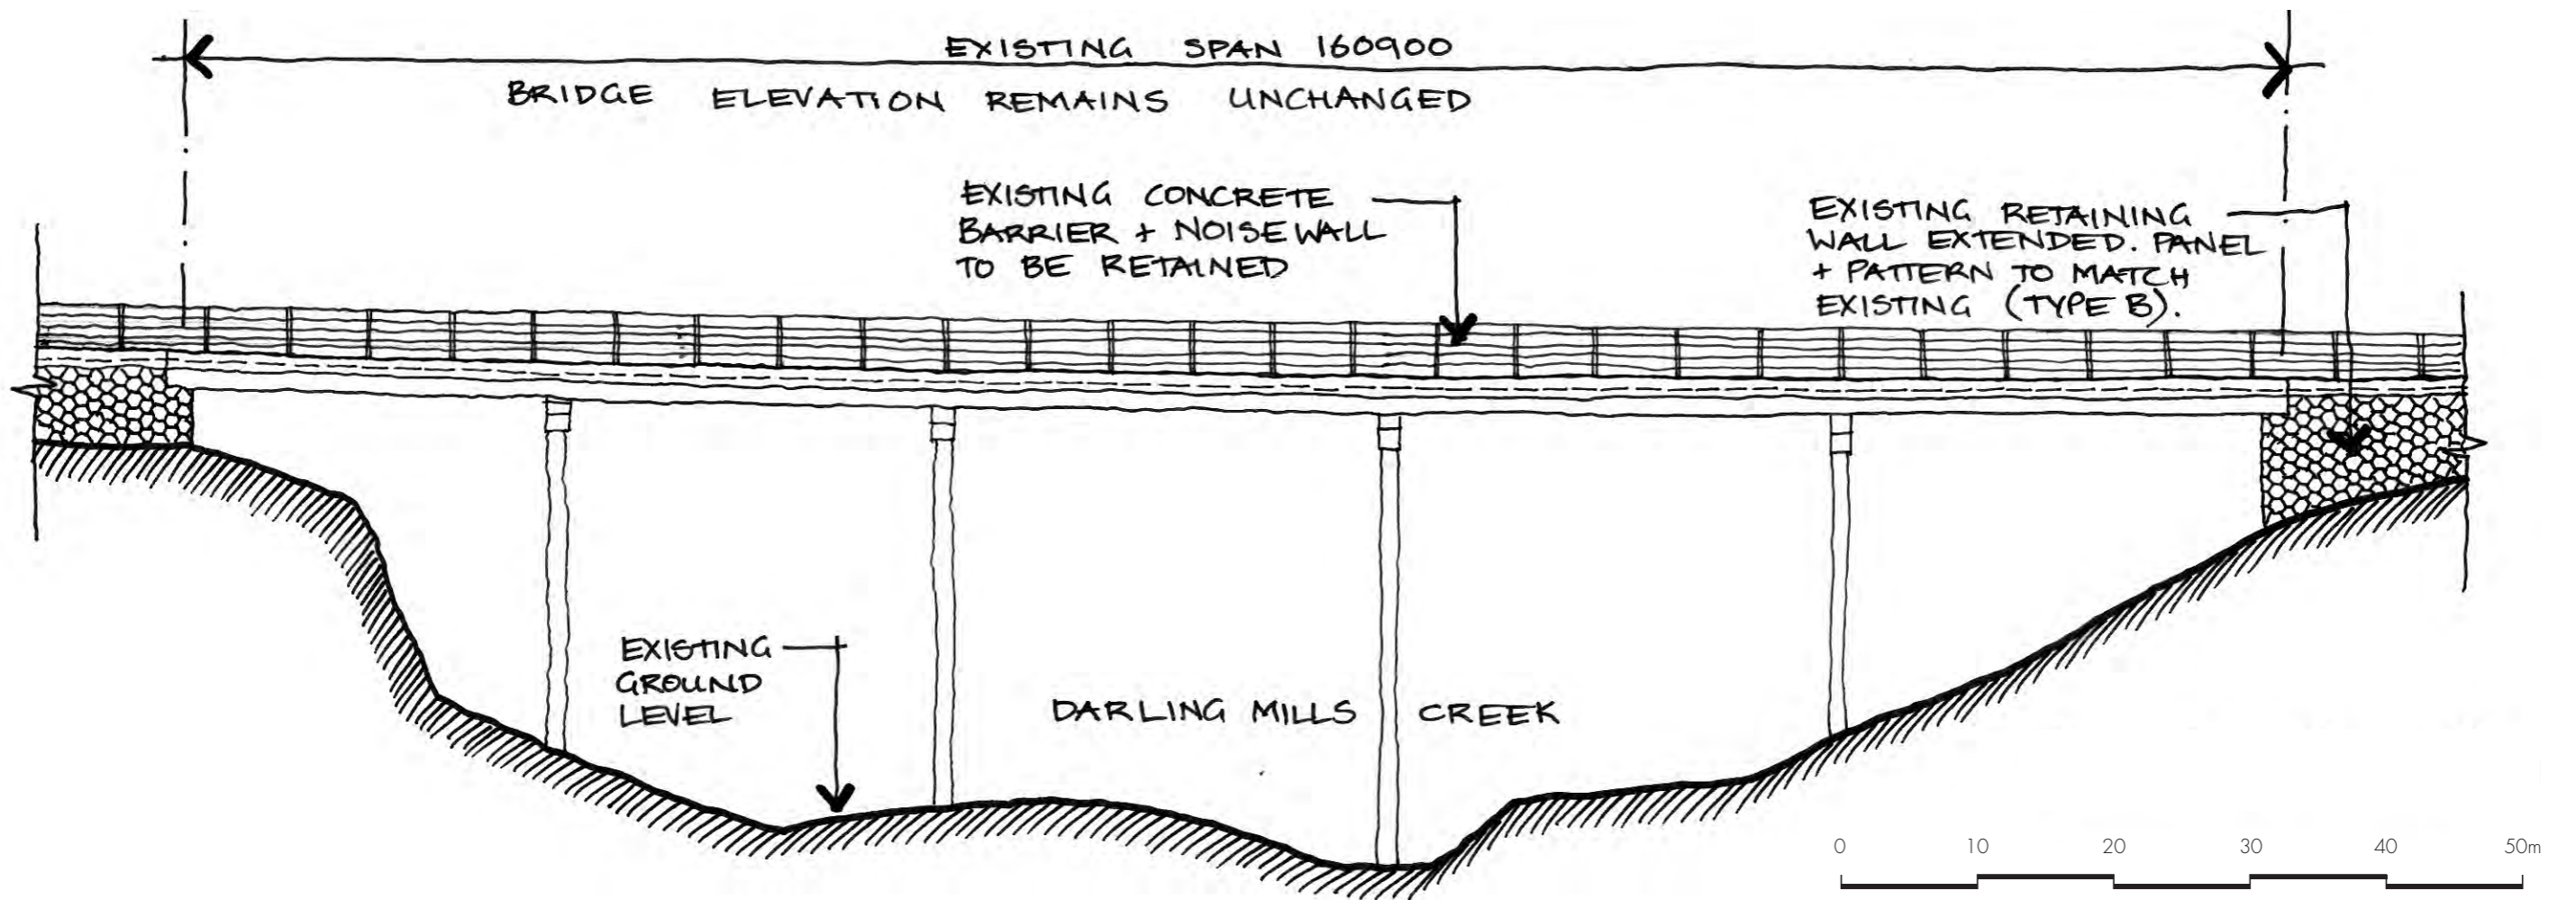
Bridge 2.1 Darling Mills Creek Bridge - Elevation
